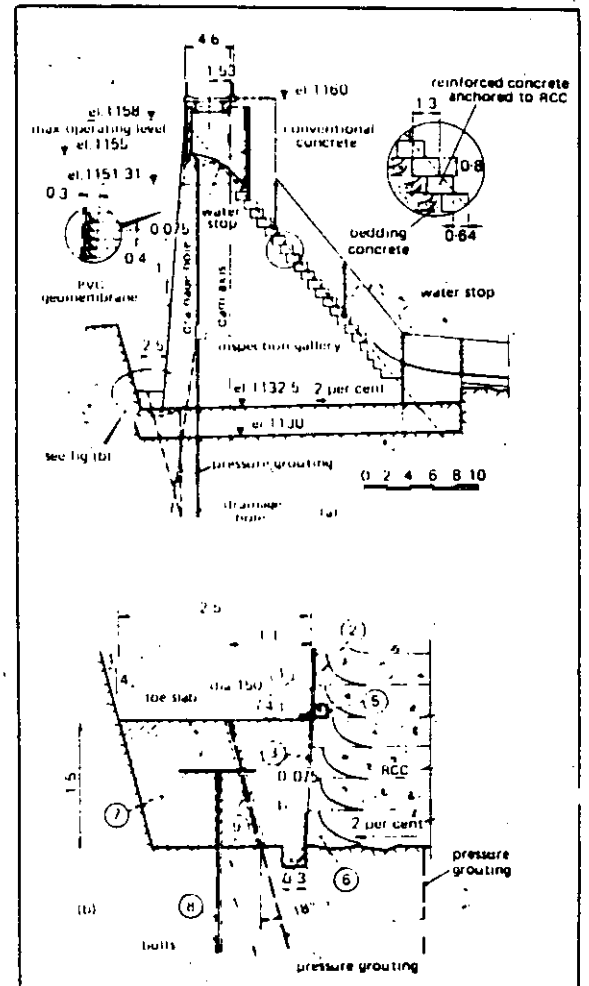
(Above) Section through the spillway; and, (below) detail of the toe slab for anchoring the PVC membrane.
